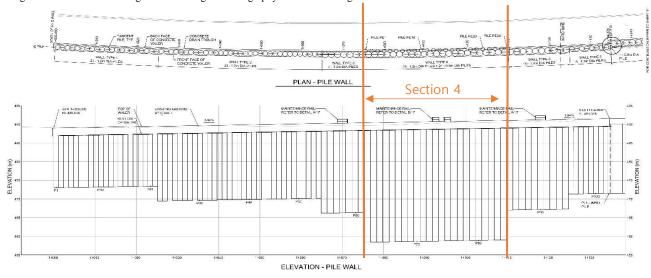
Elevation and plan view of pile wall showing location of design Section 4.
